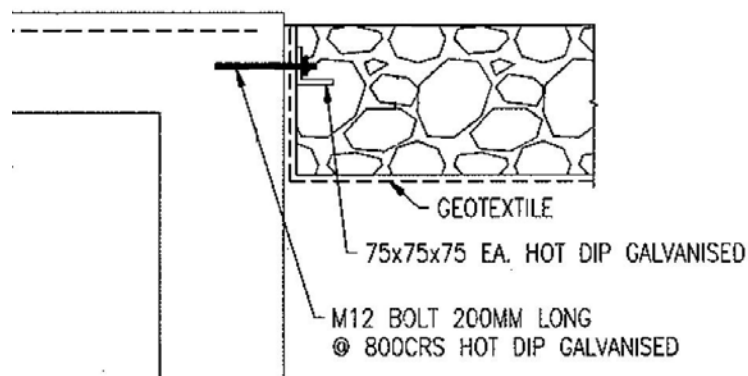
Rock filled wire mattress connection detail (LVRC 2008a).
